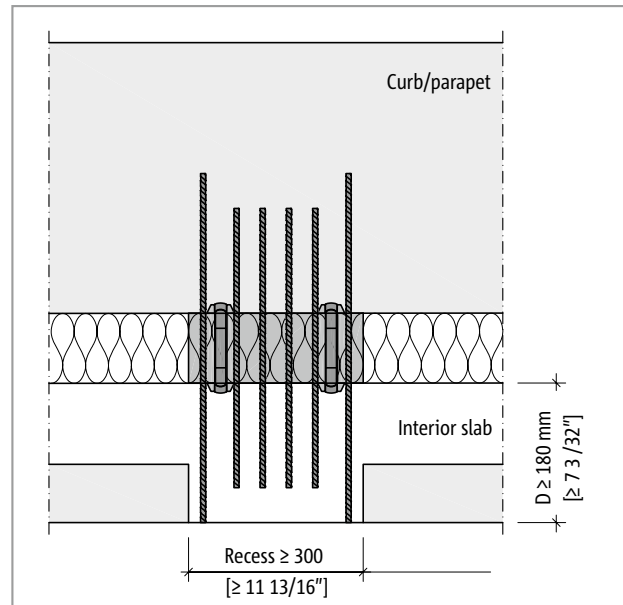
Schöck Isokorb® CXT Type CA: View; Minimum measurement Recess Component panel
